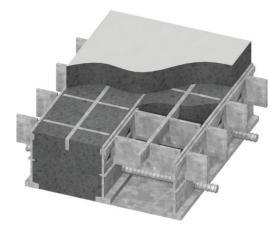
Filled Steel Grid Deck (courtesy of BGFMA (11)).
